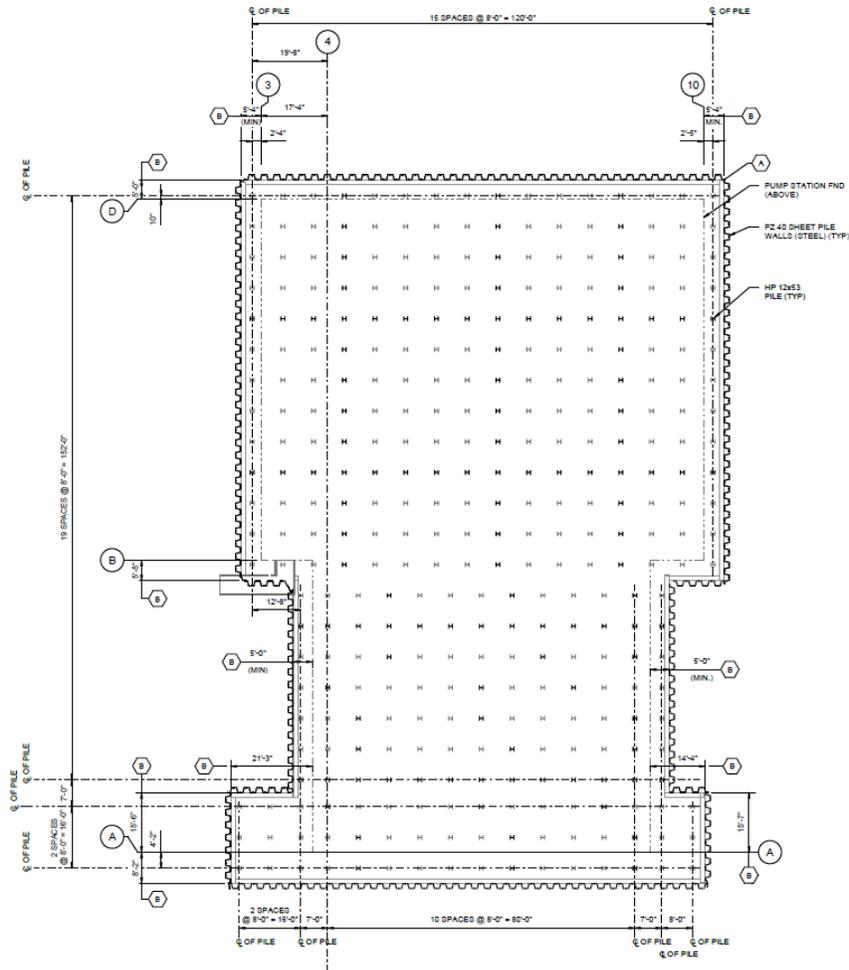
S-332B Replacement Pump Station Cofferdam Plan
